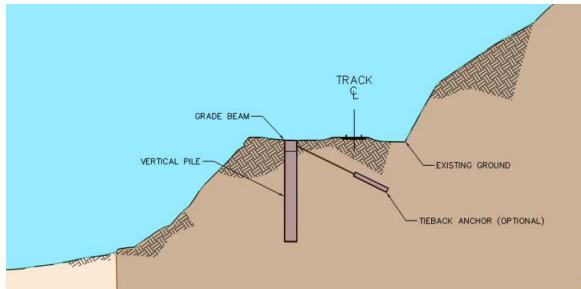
Typical Section of Soldier Pile Wall - Trackbed Support Stabilization Areas
